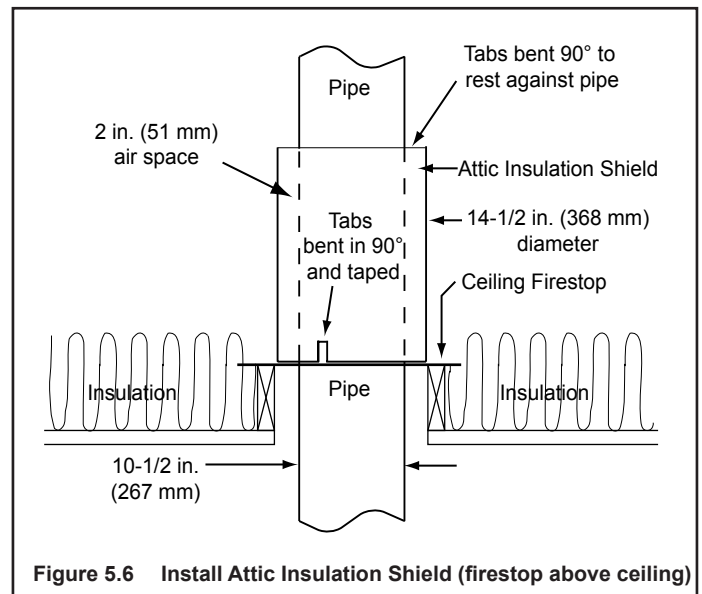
Install Attic Insulation Shield (firestop above ceiling)
